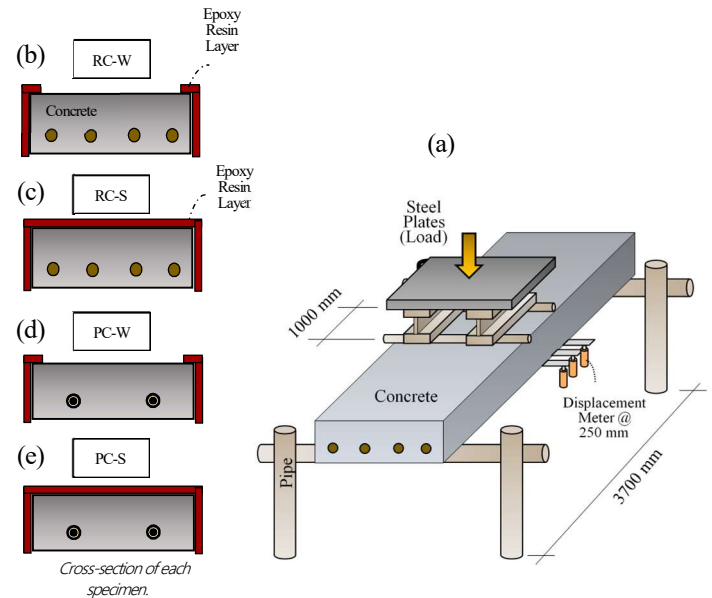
Specimen seal conditions and exposure-loading test layout.
